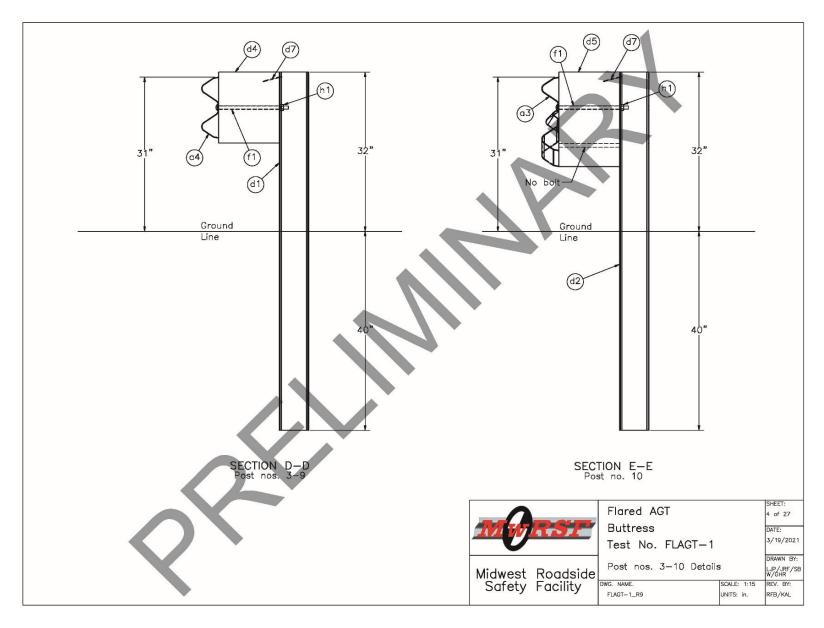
Post Nos. 3-10 Details, Test No. FLAGT-1
